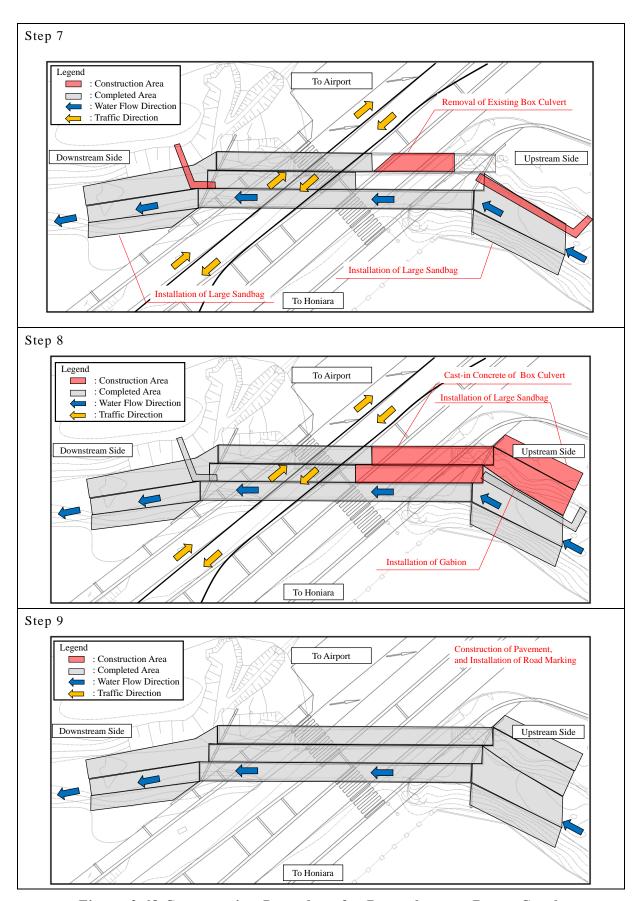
Construction Procedure for Box culvert at Burns Creek
